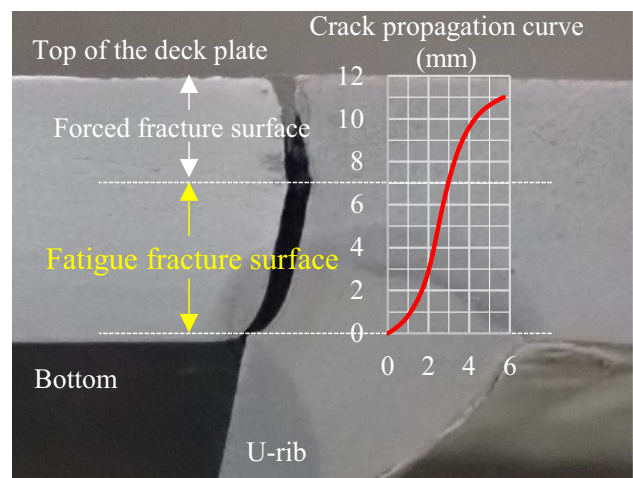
A cross-sectional photograph of the deepest part of Crack 1
